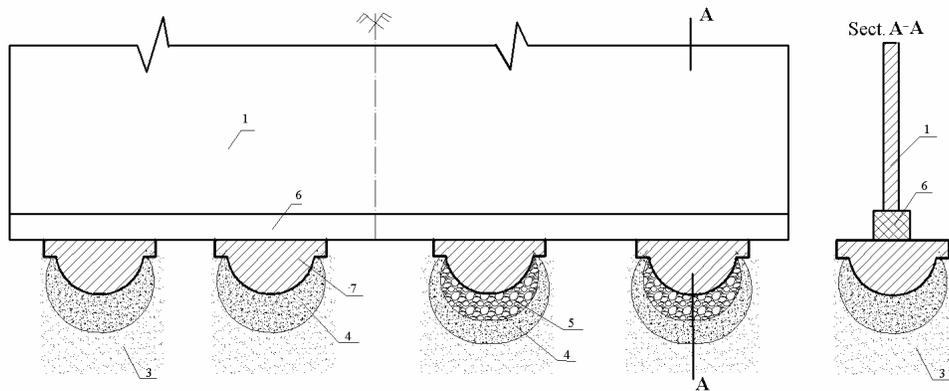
Semi-sphere punched foundations used for continuous foundations under walls (1- wall, 3 – natural soil, 4 – improved soil, 5 - bulb, 6 - girdle, 7 – semi-sphere with anti-pressing plate)
